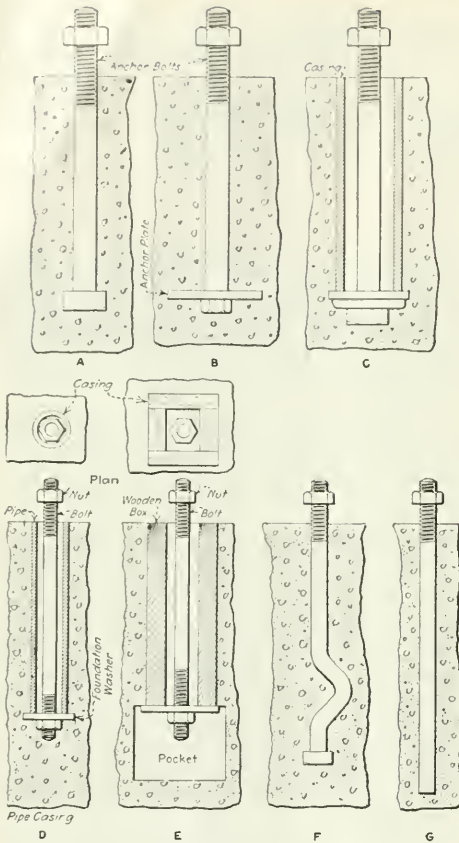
SEVEN TYPES OF FOUNDATION ANCHOR BOLTS
